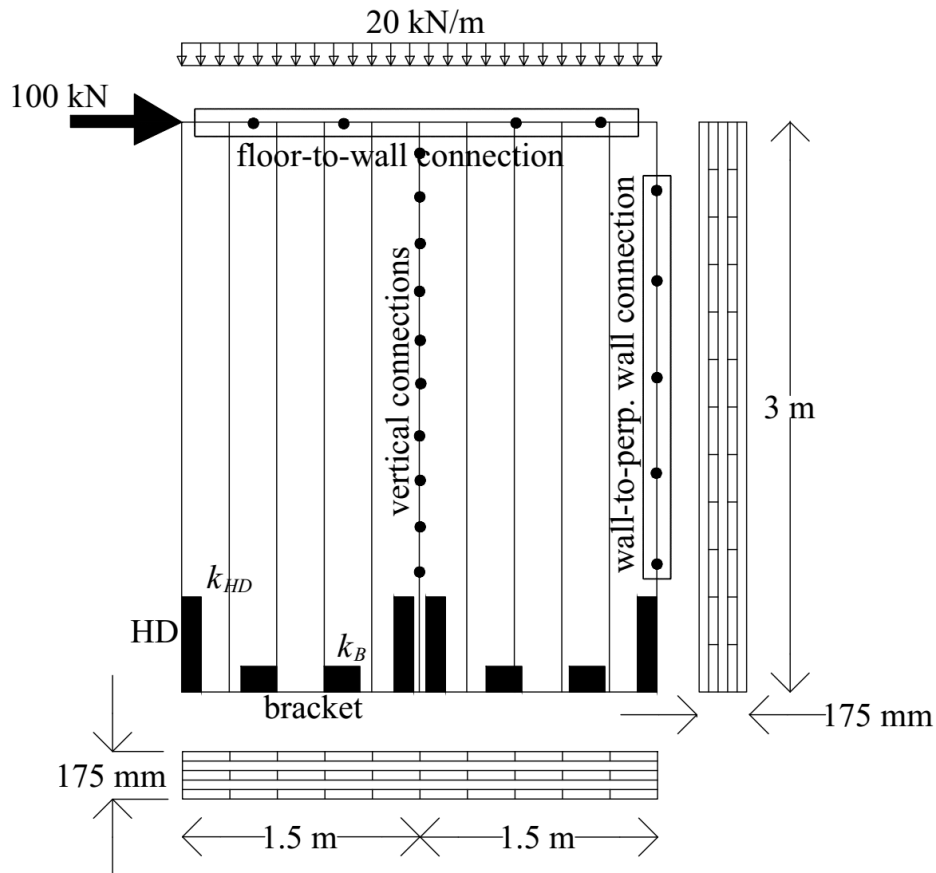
Geometry and properties of coupled CLT shear walls with 4-HDs connected to perpendicular wall and floor above
